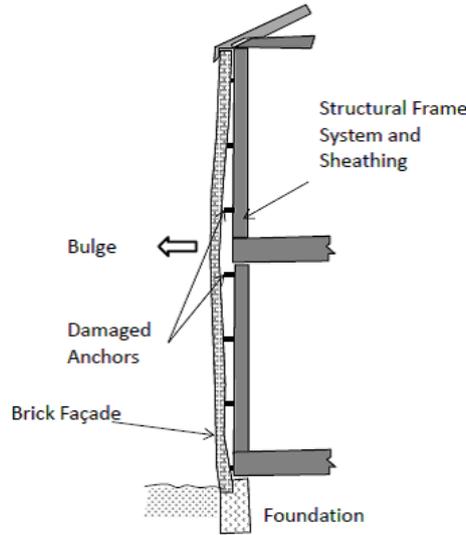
Damaged metal anchor causing brick wall to bulge out
